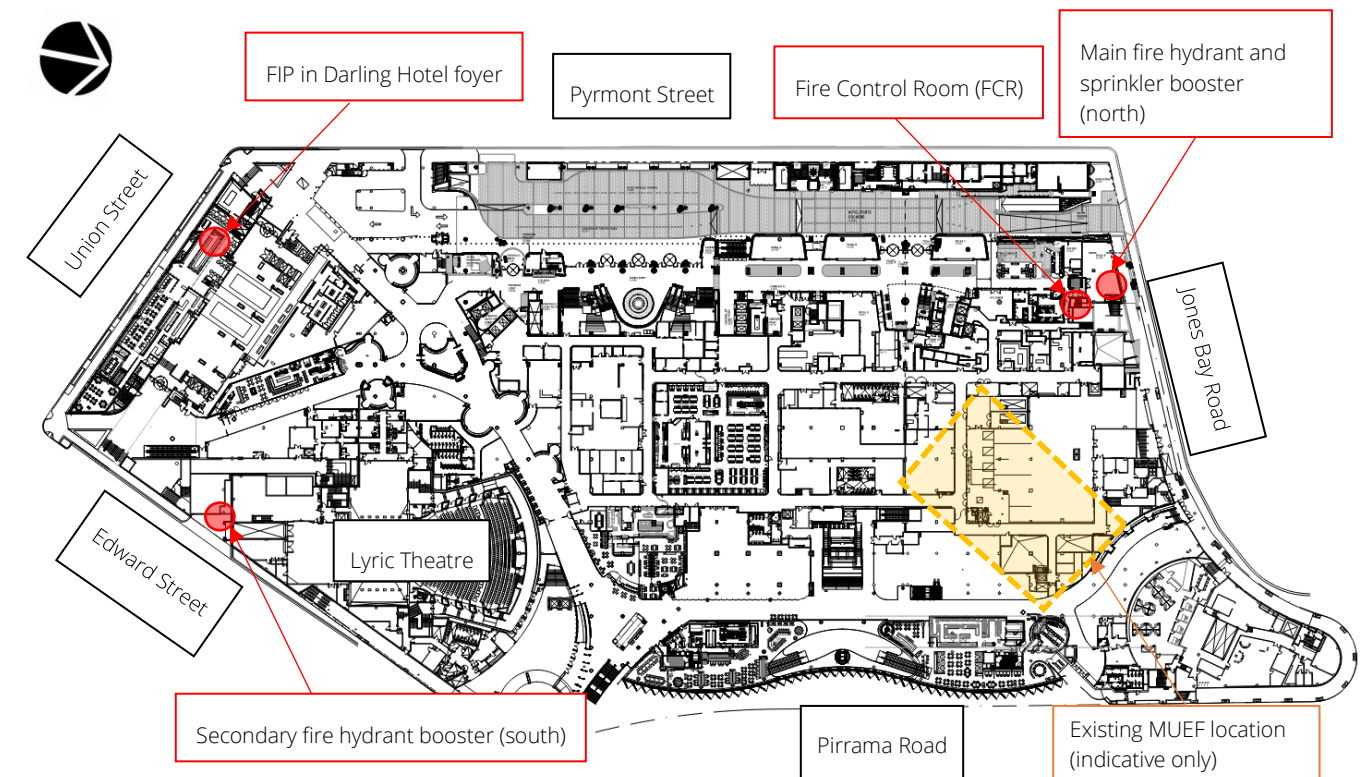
Floor Plan of Existing Star Casino Site – (Google Maps© 2021)
